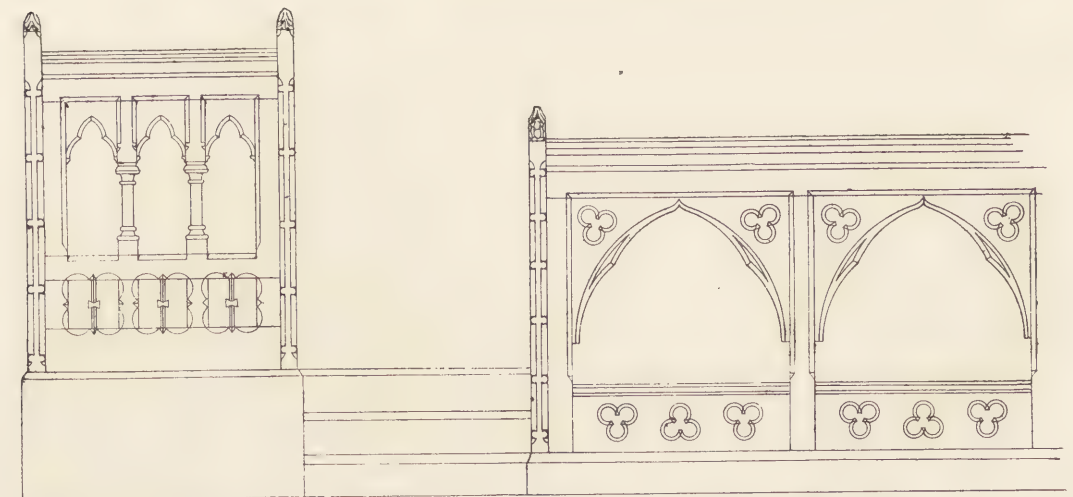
FRONT ELEVATION OF STALLS: ROCHESTER CATHEDRAL.
